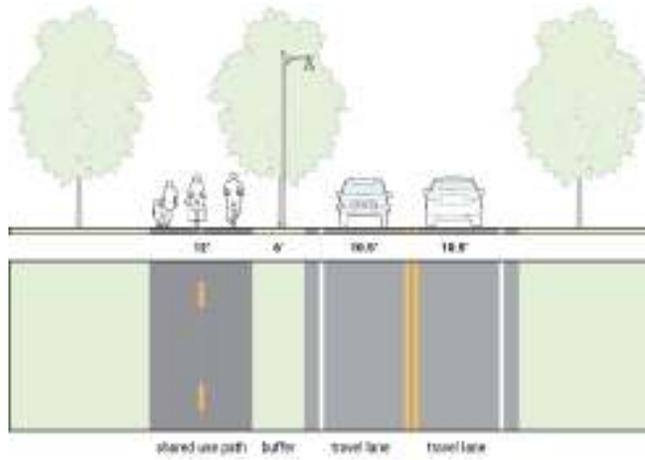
Hammond Pond Parkway Segment 3 Long-term with Two Lane Cross Section
